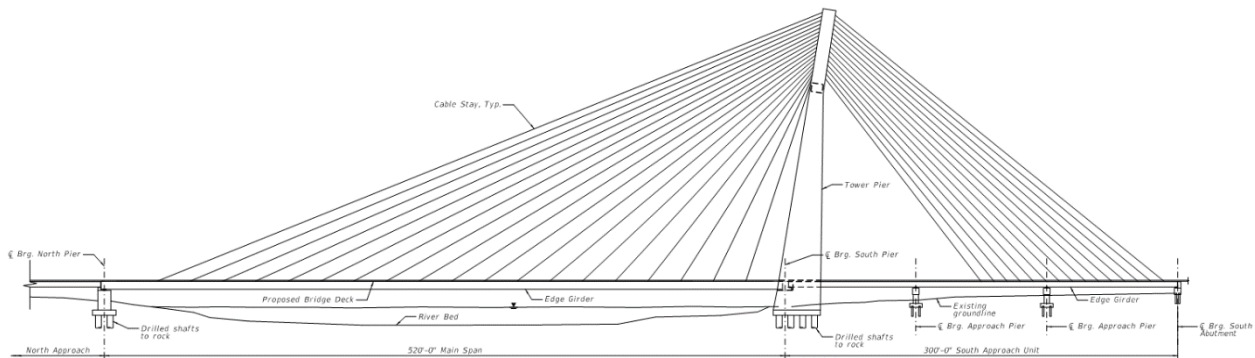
CABLE-STAYED ELEVATION VIEW
